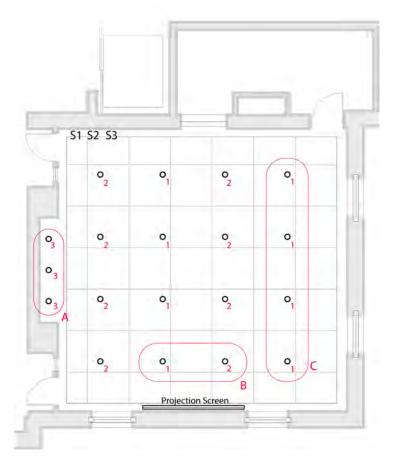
Proposed Lighting Plan Clean and relamp existing recessed downlights "R7" with new CFL lamps. (Lam Partners)
